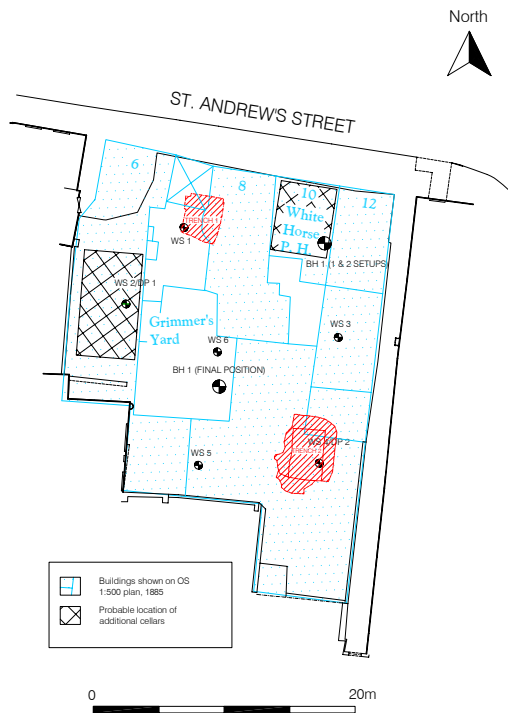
Site plan with Ordnance Survey 1885 plan, borehole locations and location of possible additional cellars, scale 1:250
